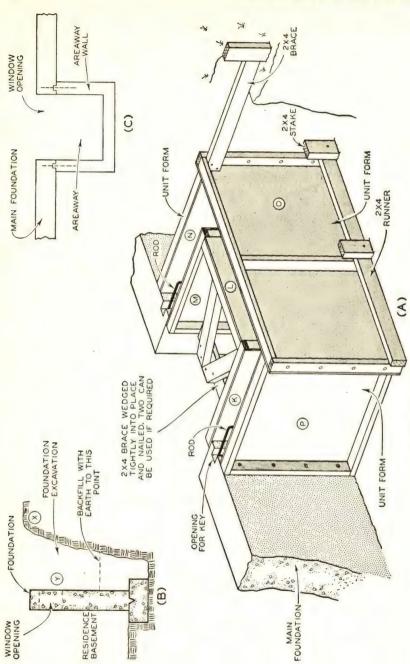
Unit Forms Used for Shallow Areaway Walls
